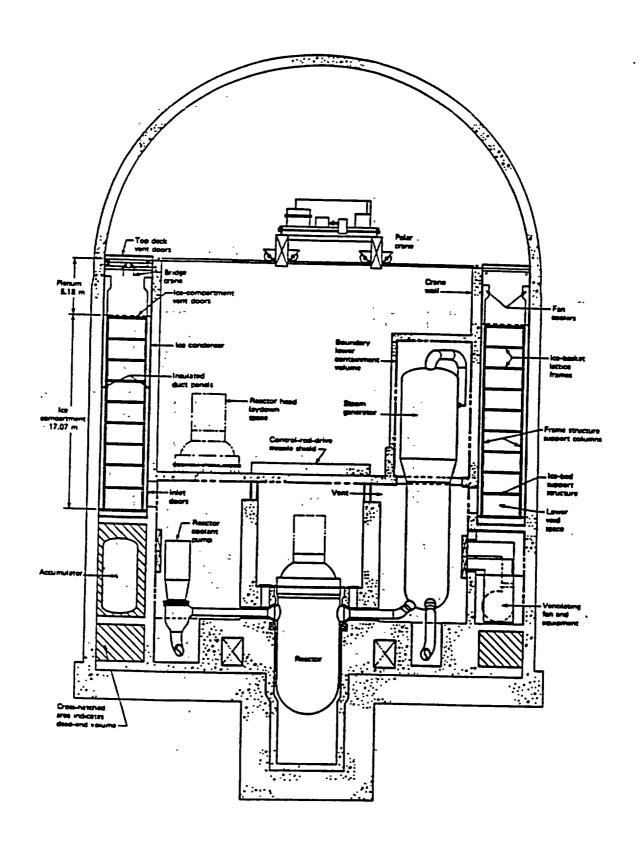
Ice Condenser Containment with Reinforced Concrete Structure and Steel Liner
